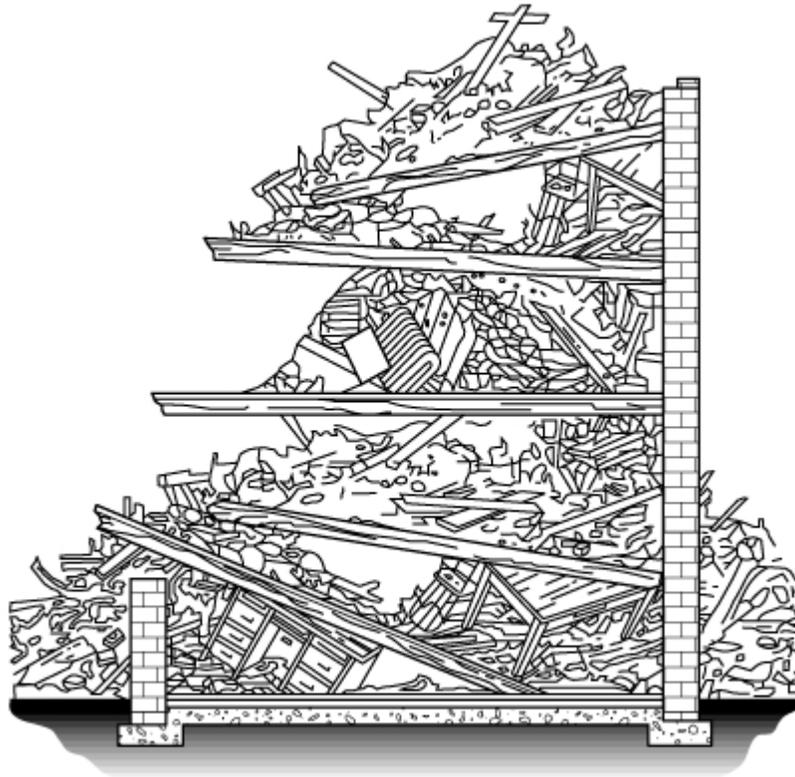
(6)(d) Cantilever Floor Collapse. (Courtesy of U.S. Department of Civil Defense)
